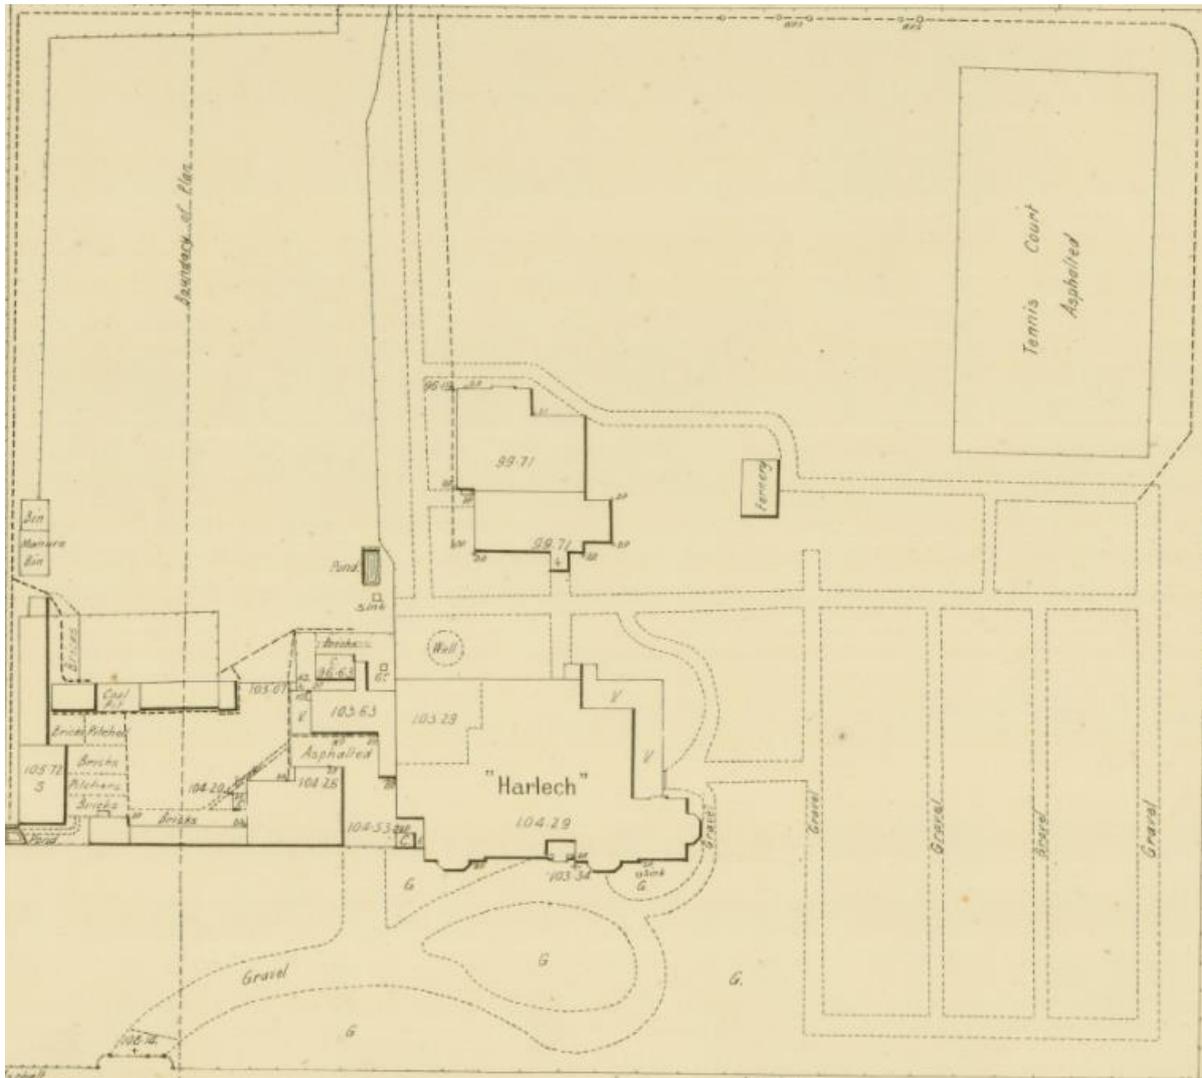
Melbourne & Metropolitan Board of Works Detail Plan No. 1486 City of Hawthorn, dated 1902, showing 'Harlech' set in large grounds with a fernery, tennis court and stable block behind the main house, as well as various outbuildings west of the house. The outline of two bay windows is also visible on the front elevation of the house with a third bay window facing east. (Source: State Library Victoria)
